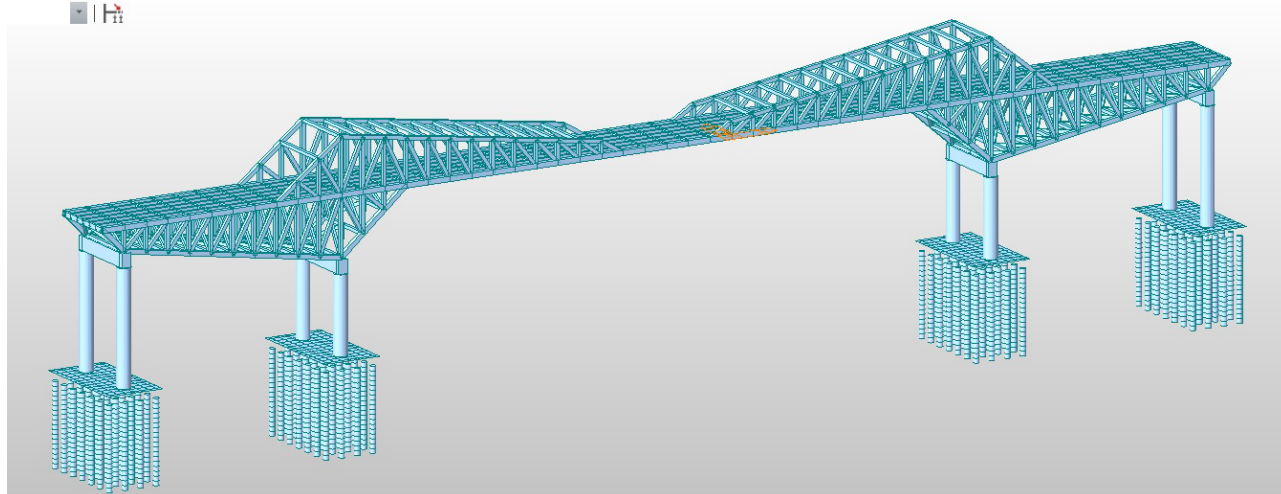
3D View of the Cantilever Steel Truss Bridge.
